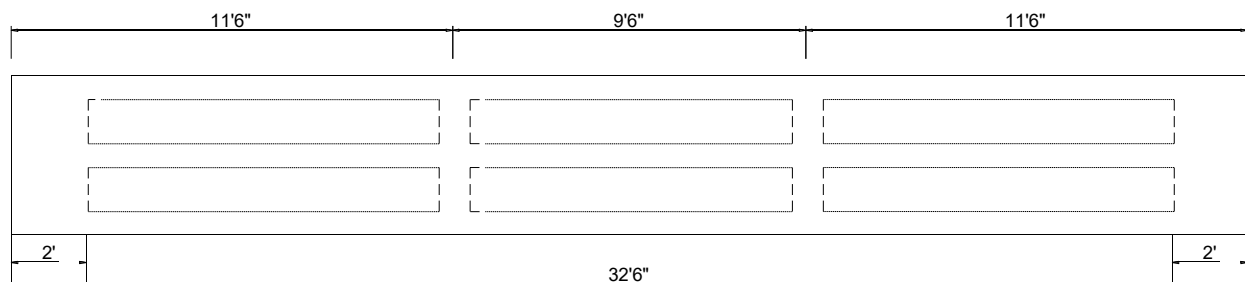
Longitudinal section of prestressed concrete box girders of CR 30 Bridge over Tom Creek
